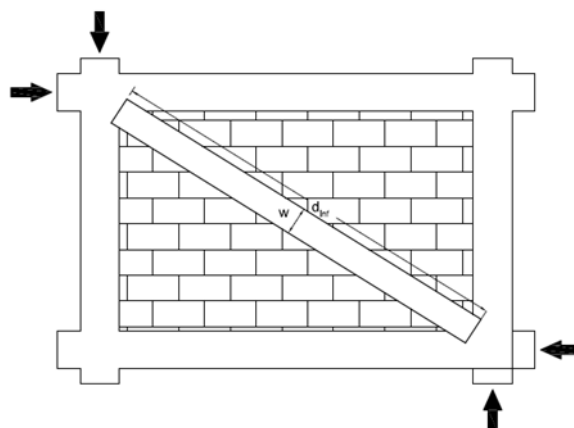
Equivalent diagonal struts method for modeling masonry infill walls
